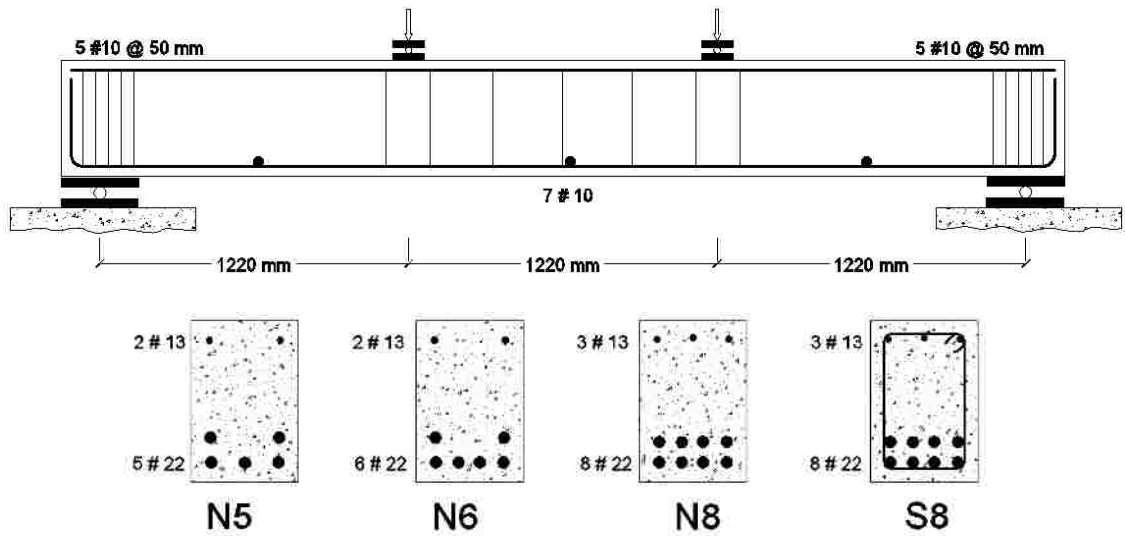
Typical beam details without shear reinforcement at the test region and cross sections with different longitudinal reinforcement layouts
